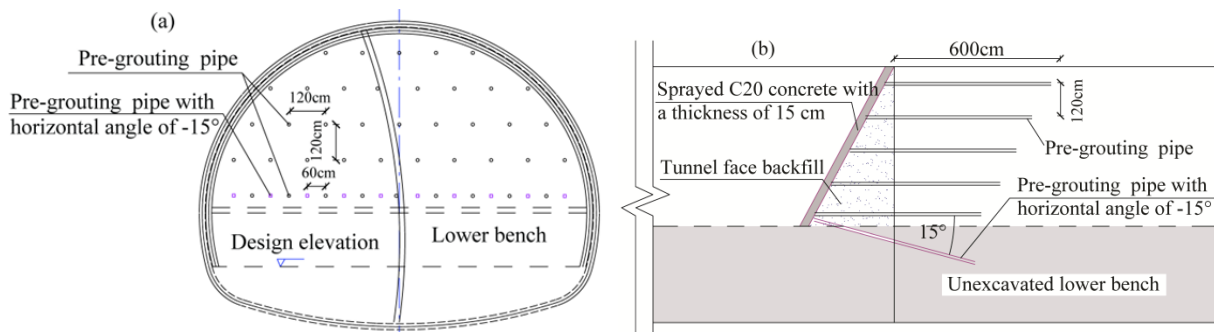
Excavating face treatment (a) Grouting on excavation surface; (b) Reinforcement of tunnel face backfill.
